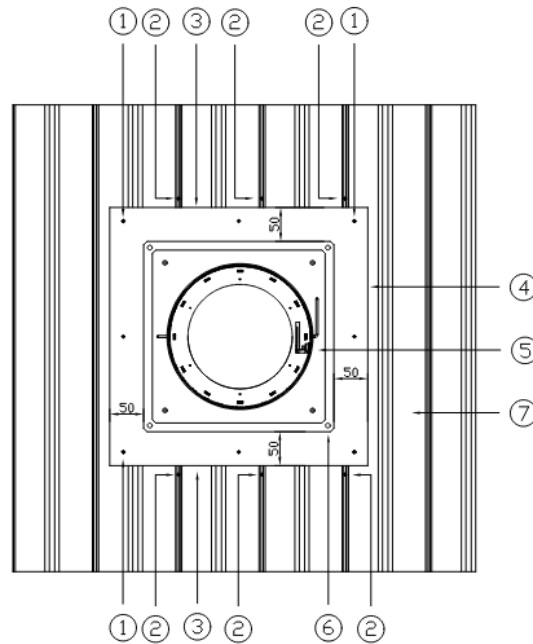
Elevation view of BSD-PW-KOROK (78 mm thick) damper
